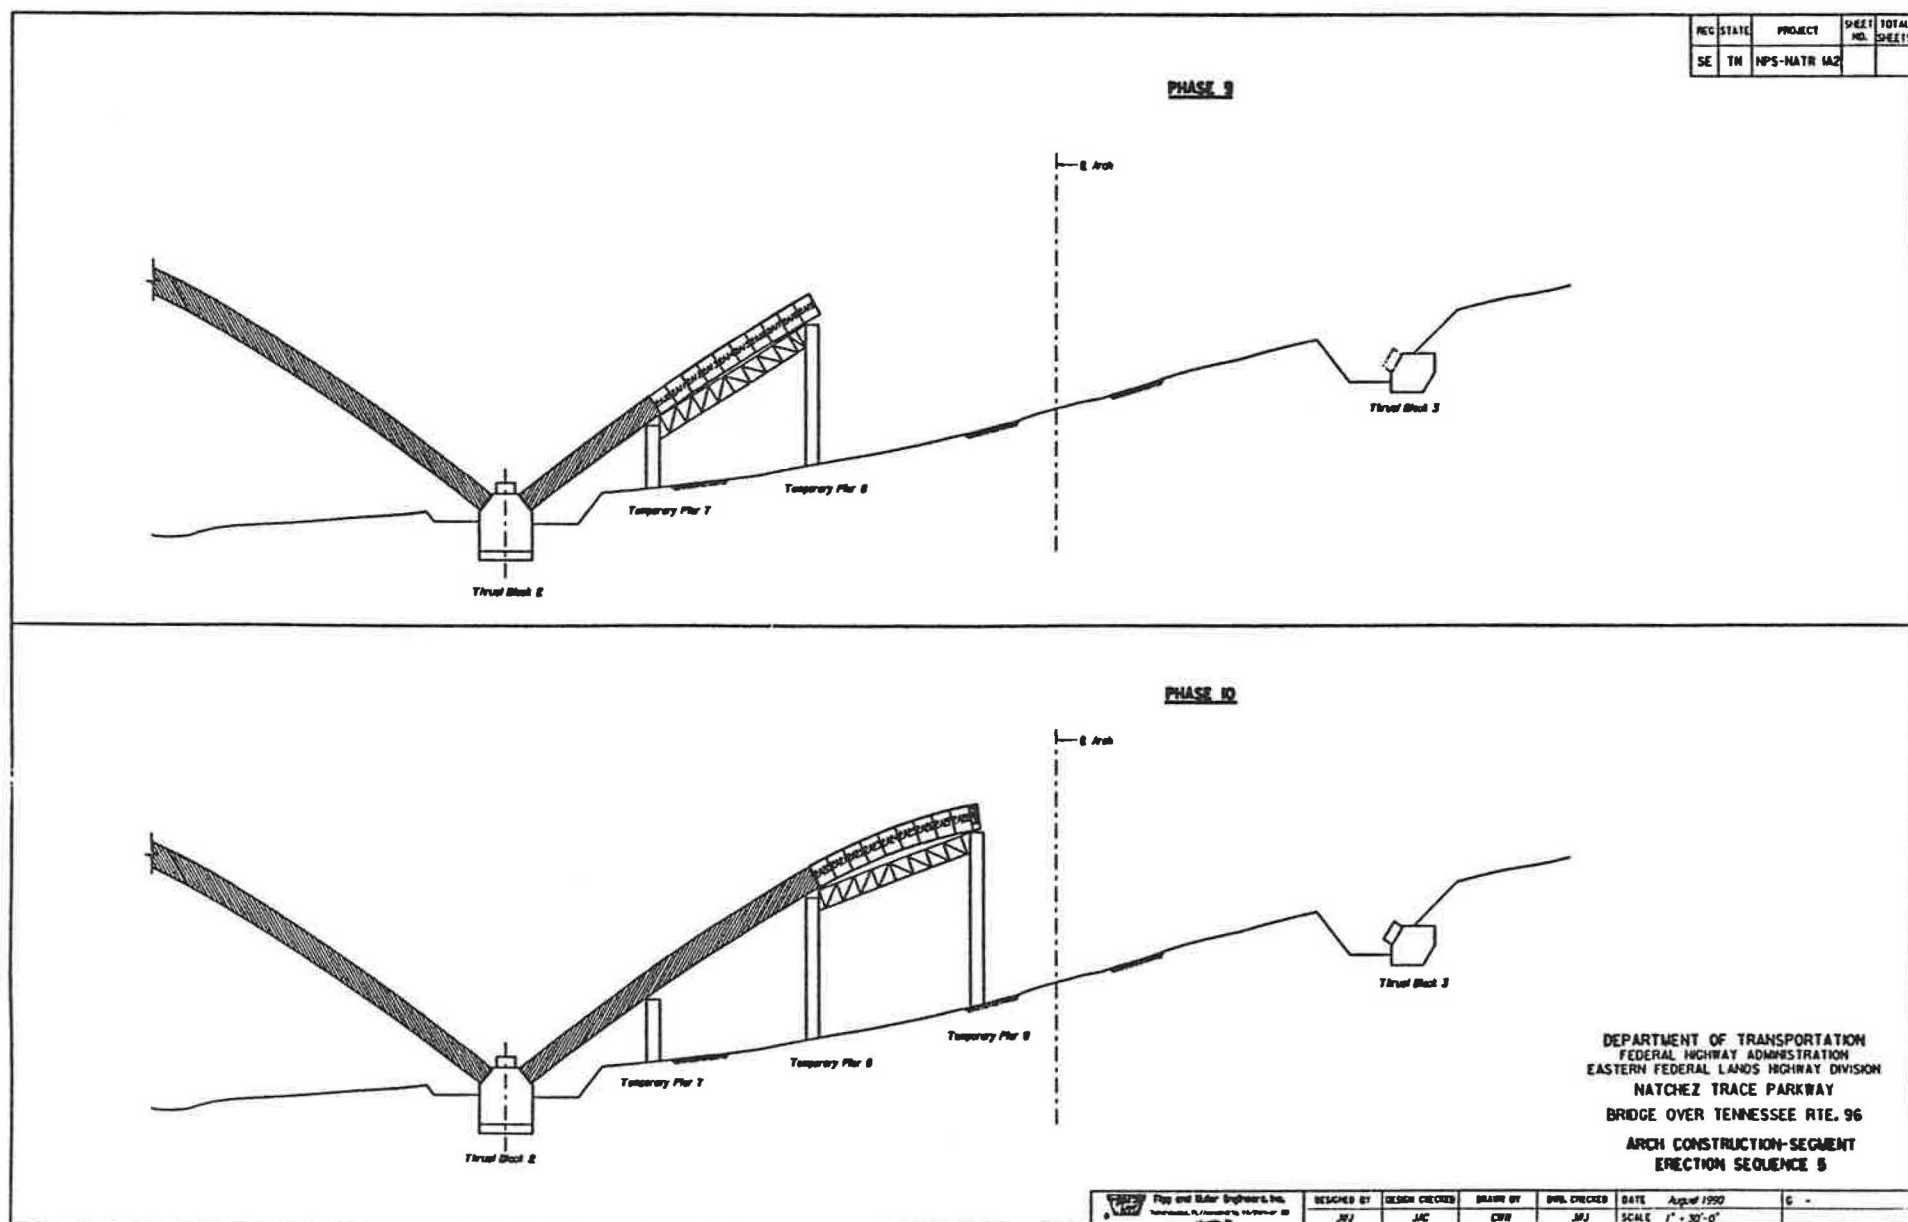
Arch construction - precast alternate - phases 9 and 10
